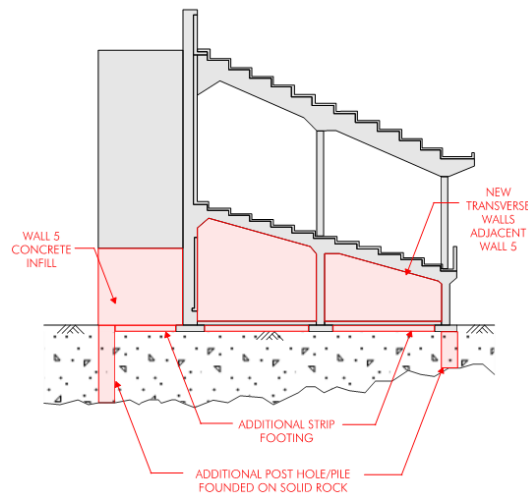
Strengthening of Wall 5 and adjacent walls and foundations: Grid 6 and 7
